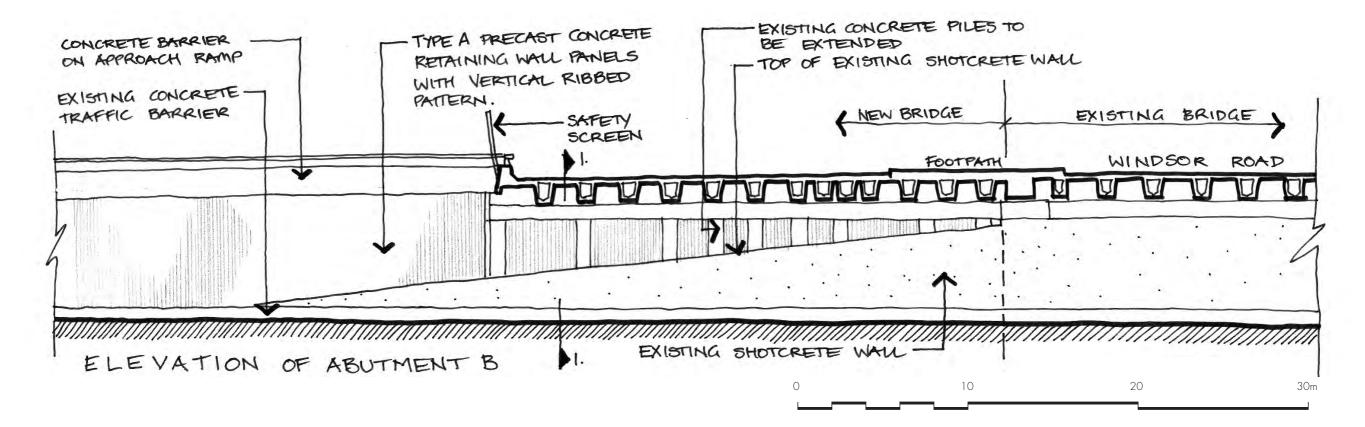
Type A Retaining Wall Section and Elevation Detail
